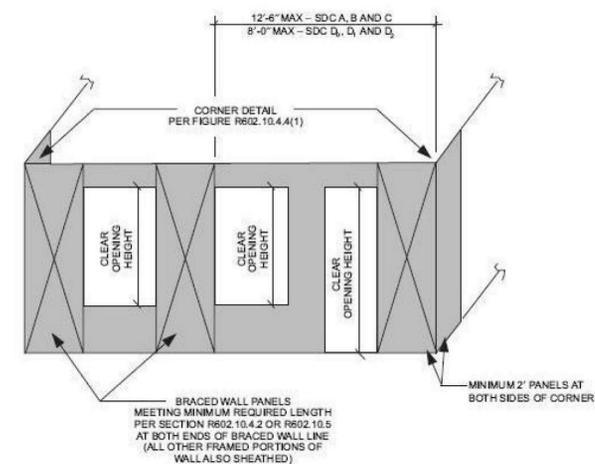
(4) BRACED WALL LINE WITH CONTINUOUS SHEATHING FIRST BRACED WALL PANEL AWAY FROM END OF WALL LINE WITHOUT TIE DOWN
